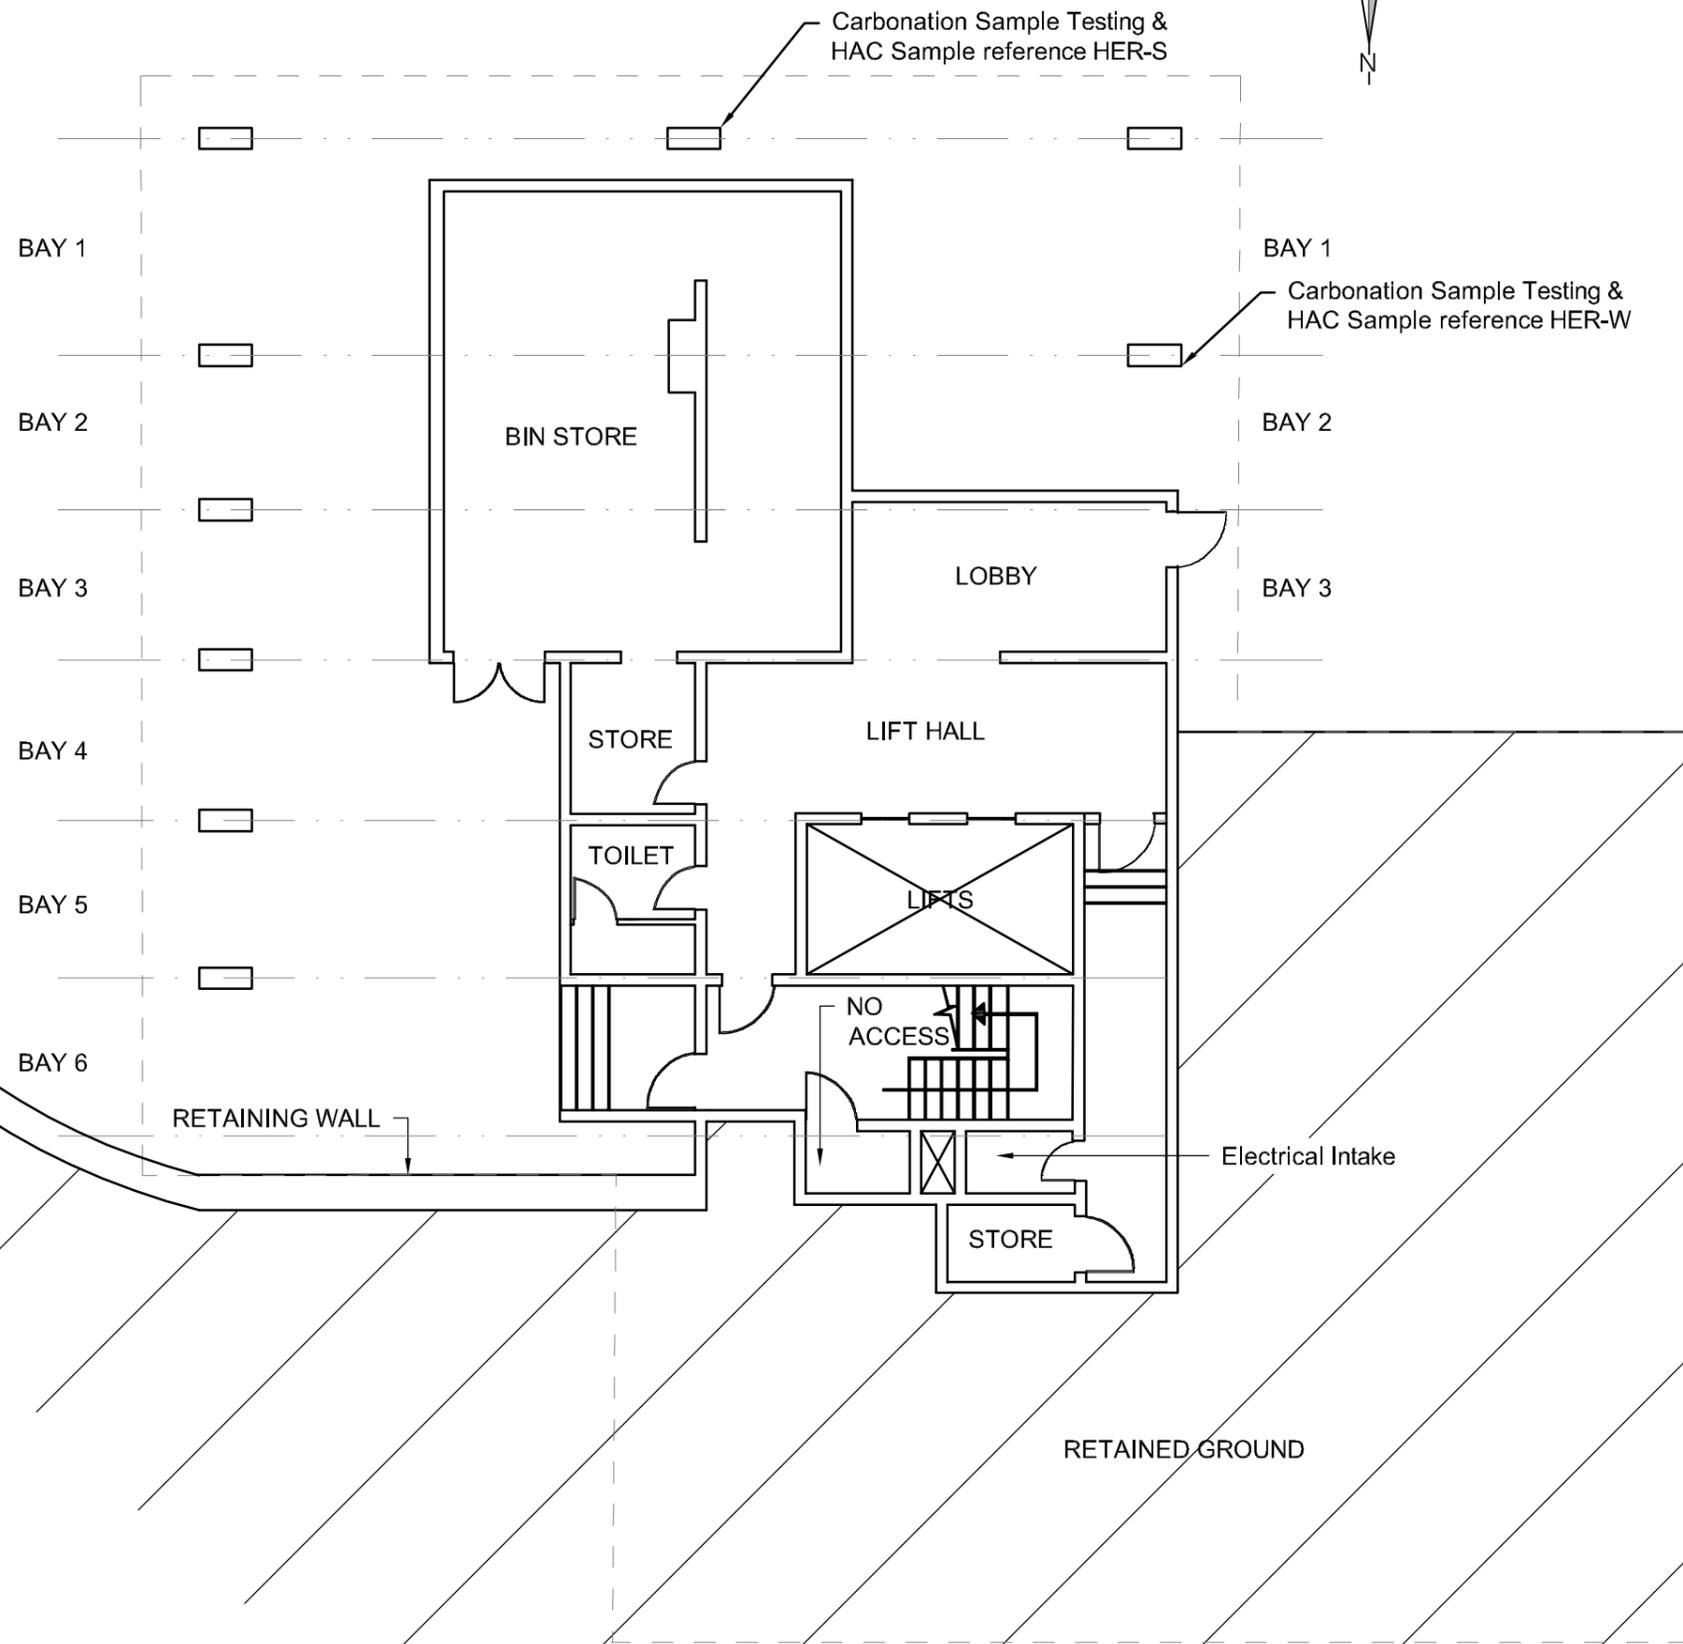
PEV-02-00-DR-S-0201	-	Ground Floor Layout Plan
